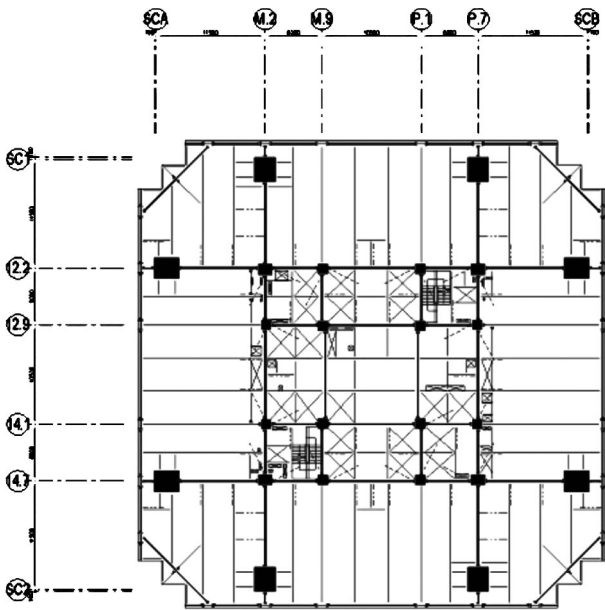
Plan view of the frame system on the 47th floor of the TFC construction site.
